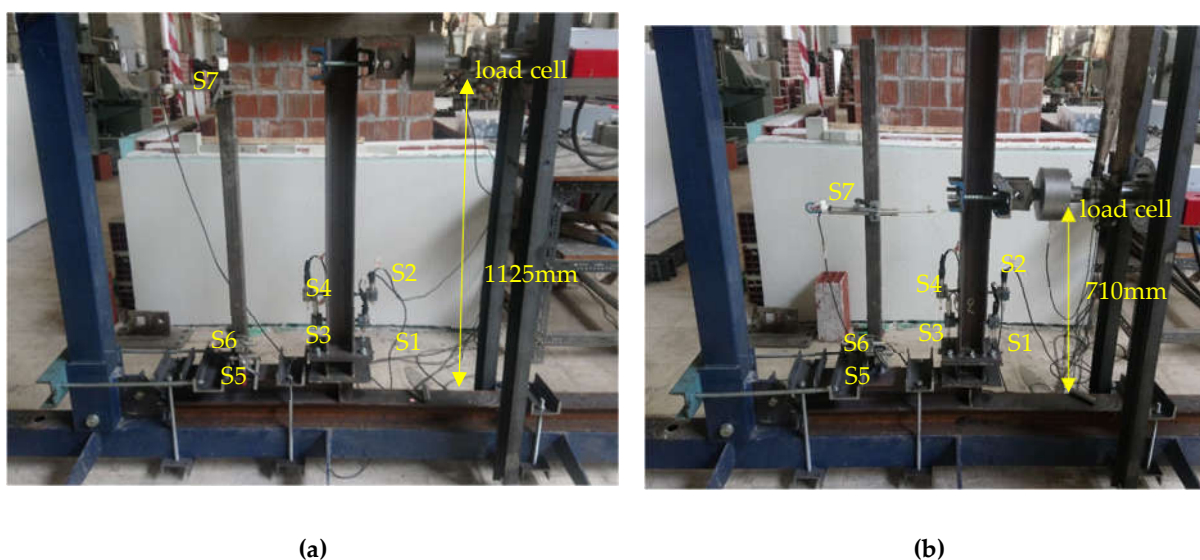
Experimental setup for (a) the JL-4 and (b) the JL-6 steel bolted joint specimen.
